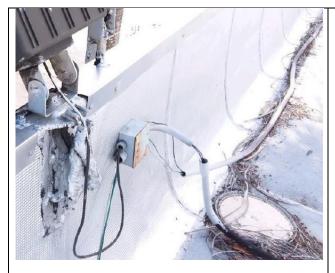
Vega Baja – 1 IN PVC Electrical Conduit
